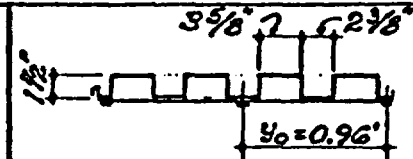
Steel Deck Diaphragm Type A - Sample Calculation No. 2
